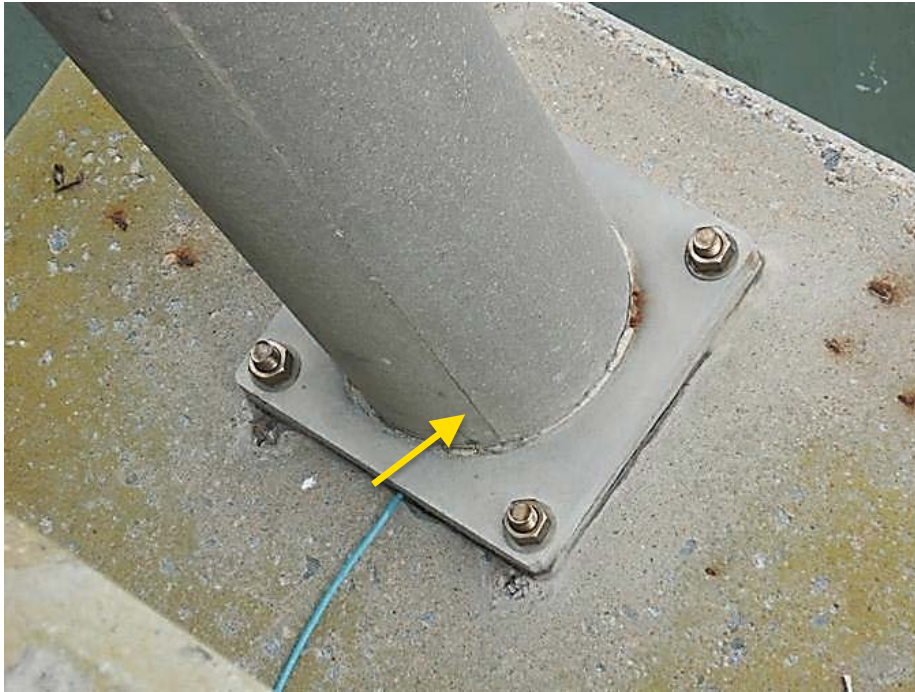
CSB133 Light Pole – Vertical Cracking Near Baseplate (Looking Northeast)
